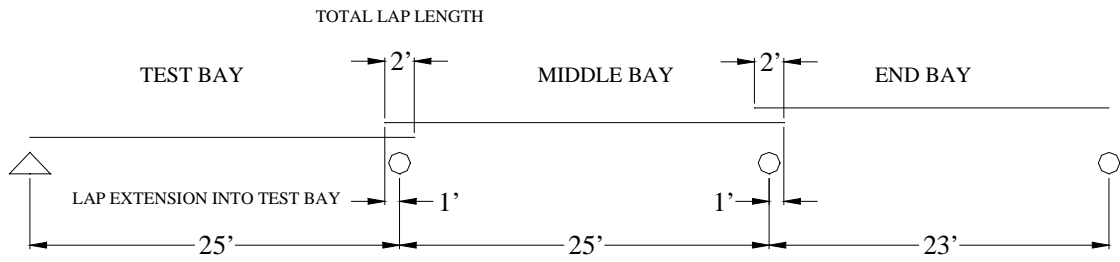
Test 1 Z-TF & Test 2 Z-SS
